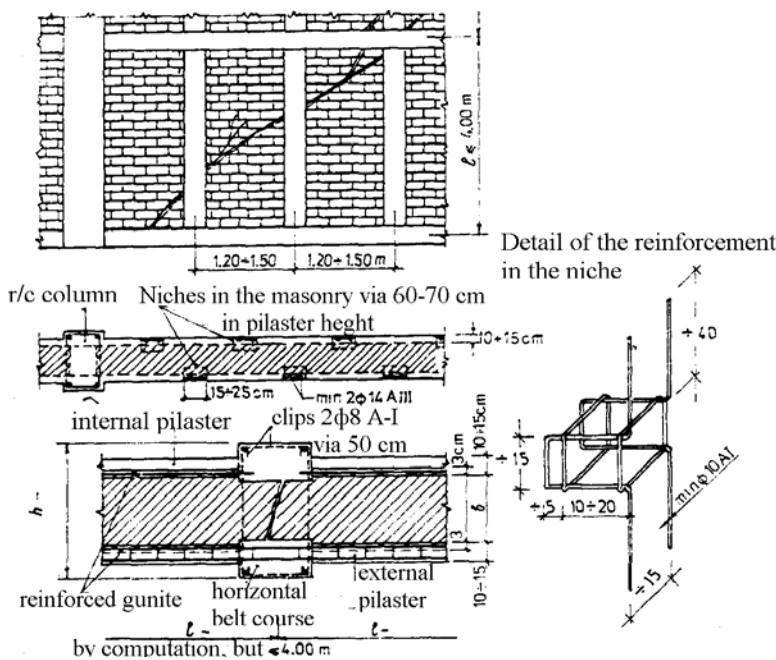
Strengthening of the masonry with strong cracks
